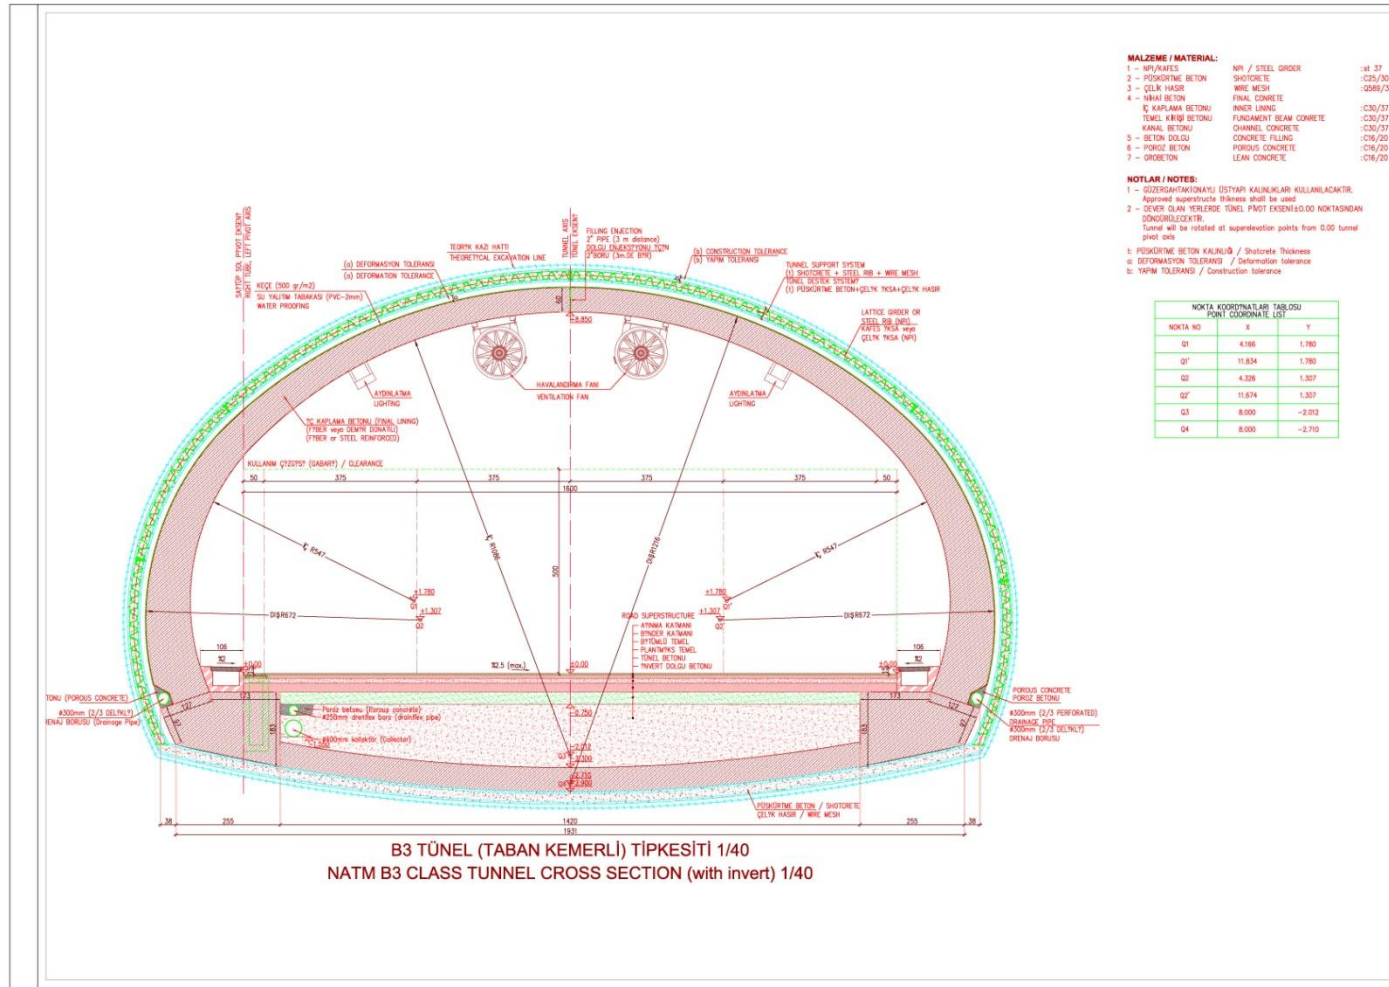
Typical Cross-section for the Tunnels (2/3)
